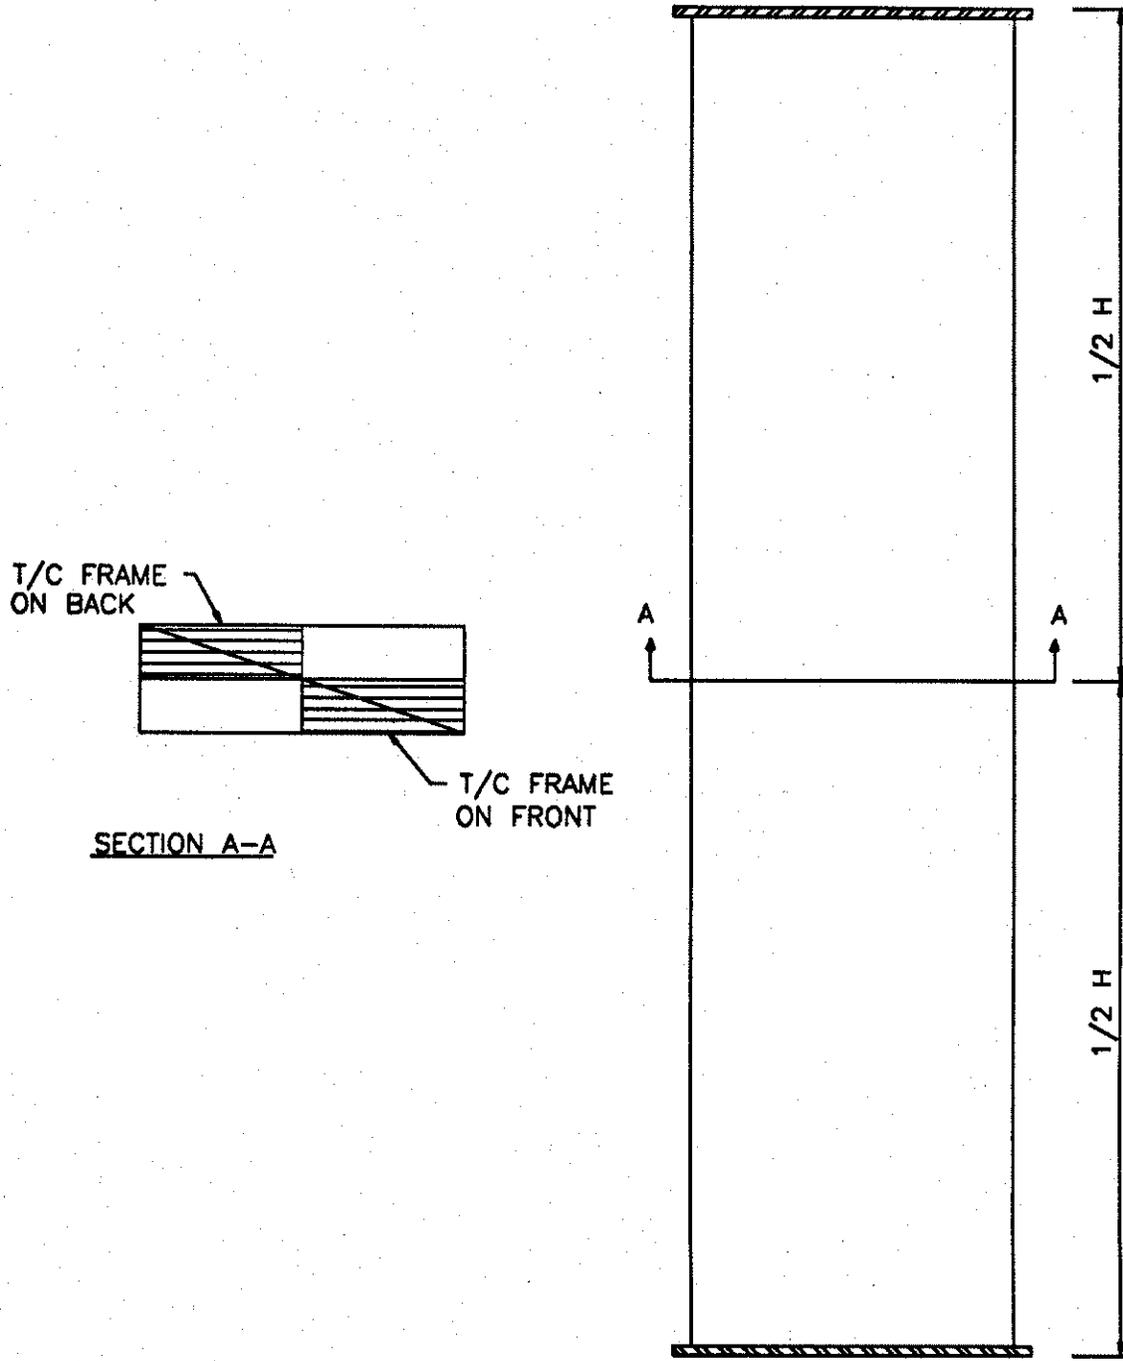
LAYOUT OF T/C FRAMES IN CONCRETE: COLUMN NO. 4 (203 x 914 mm)
